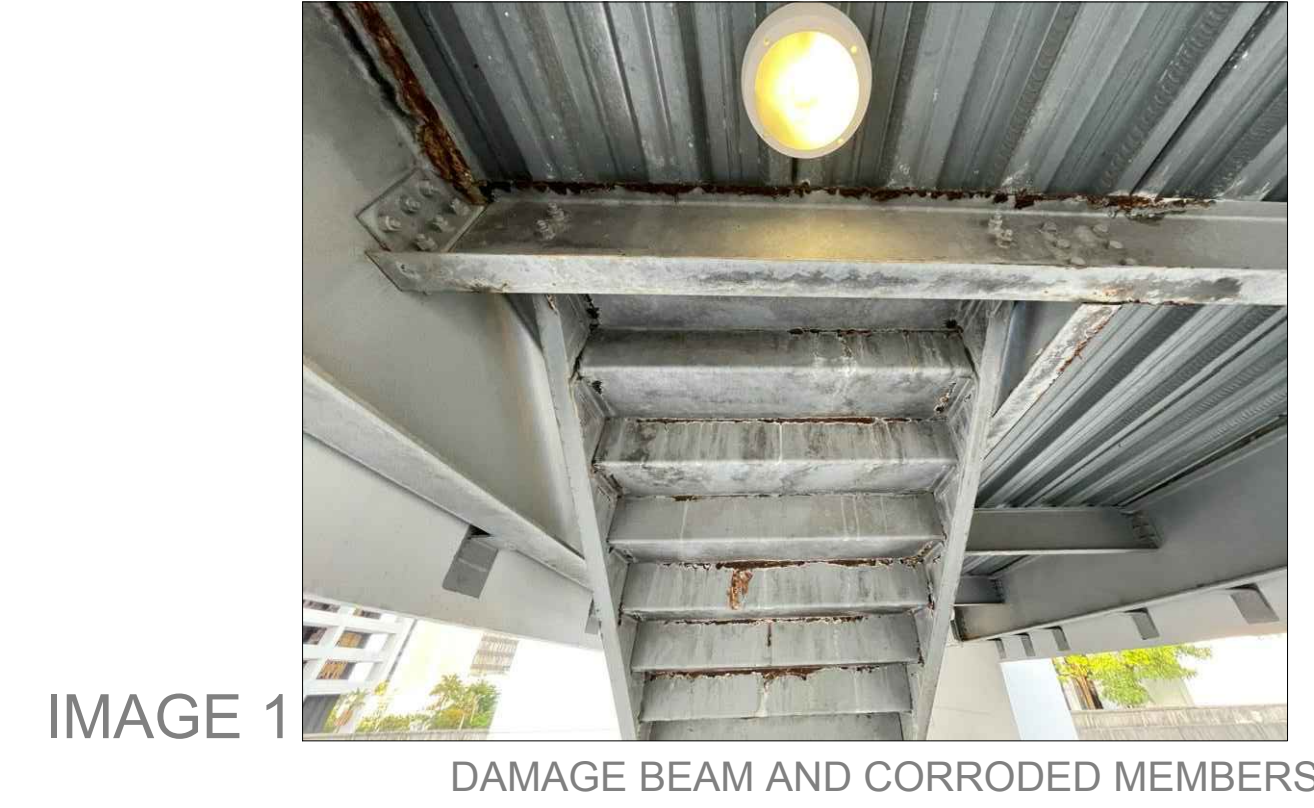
DAMAGE BEAM AND CORRODED MEMBERS
